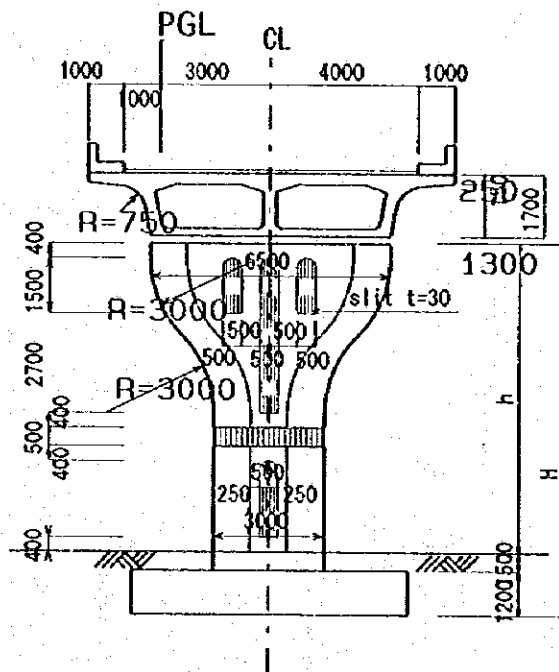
Cross-sectional Details of Super-structure Type-1 with Sub-Structure Type-4
